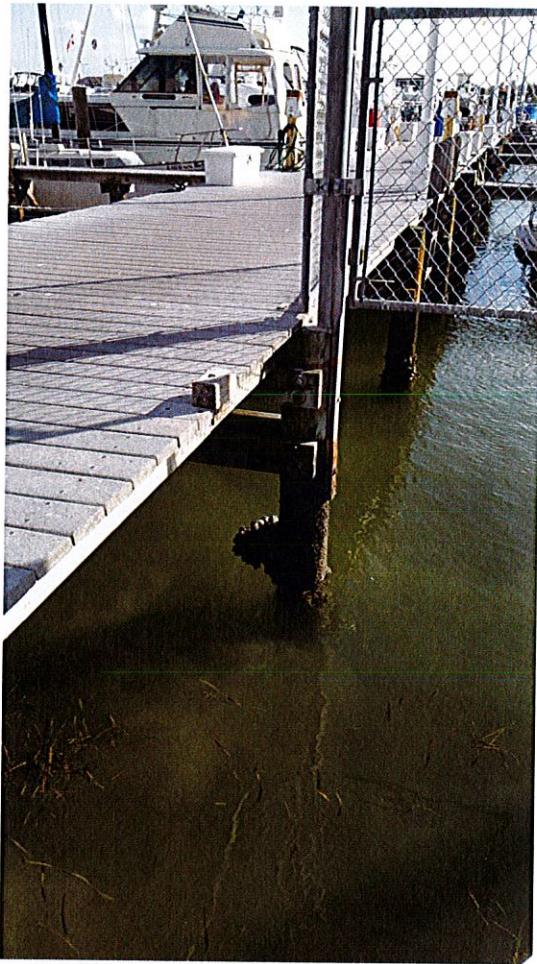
Electrical Datum Line Markings on Piling (one for west main docks and the other for east docks)
